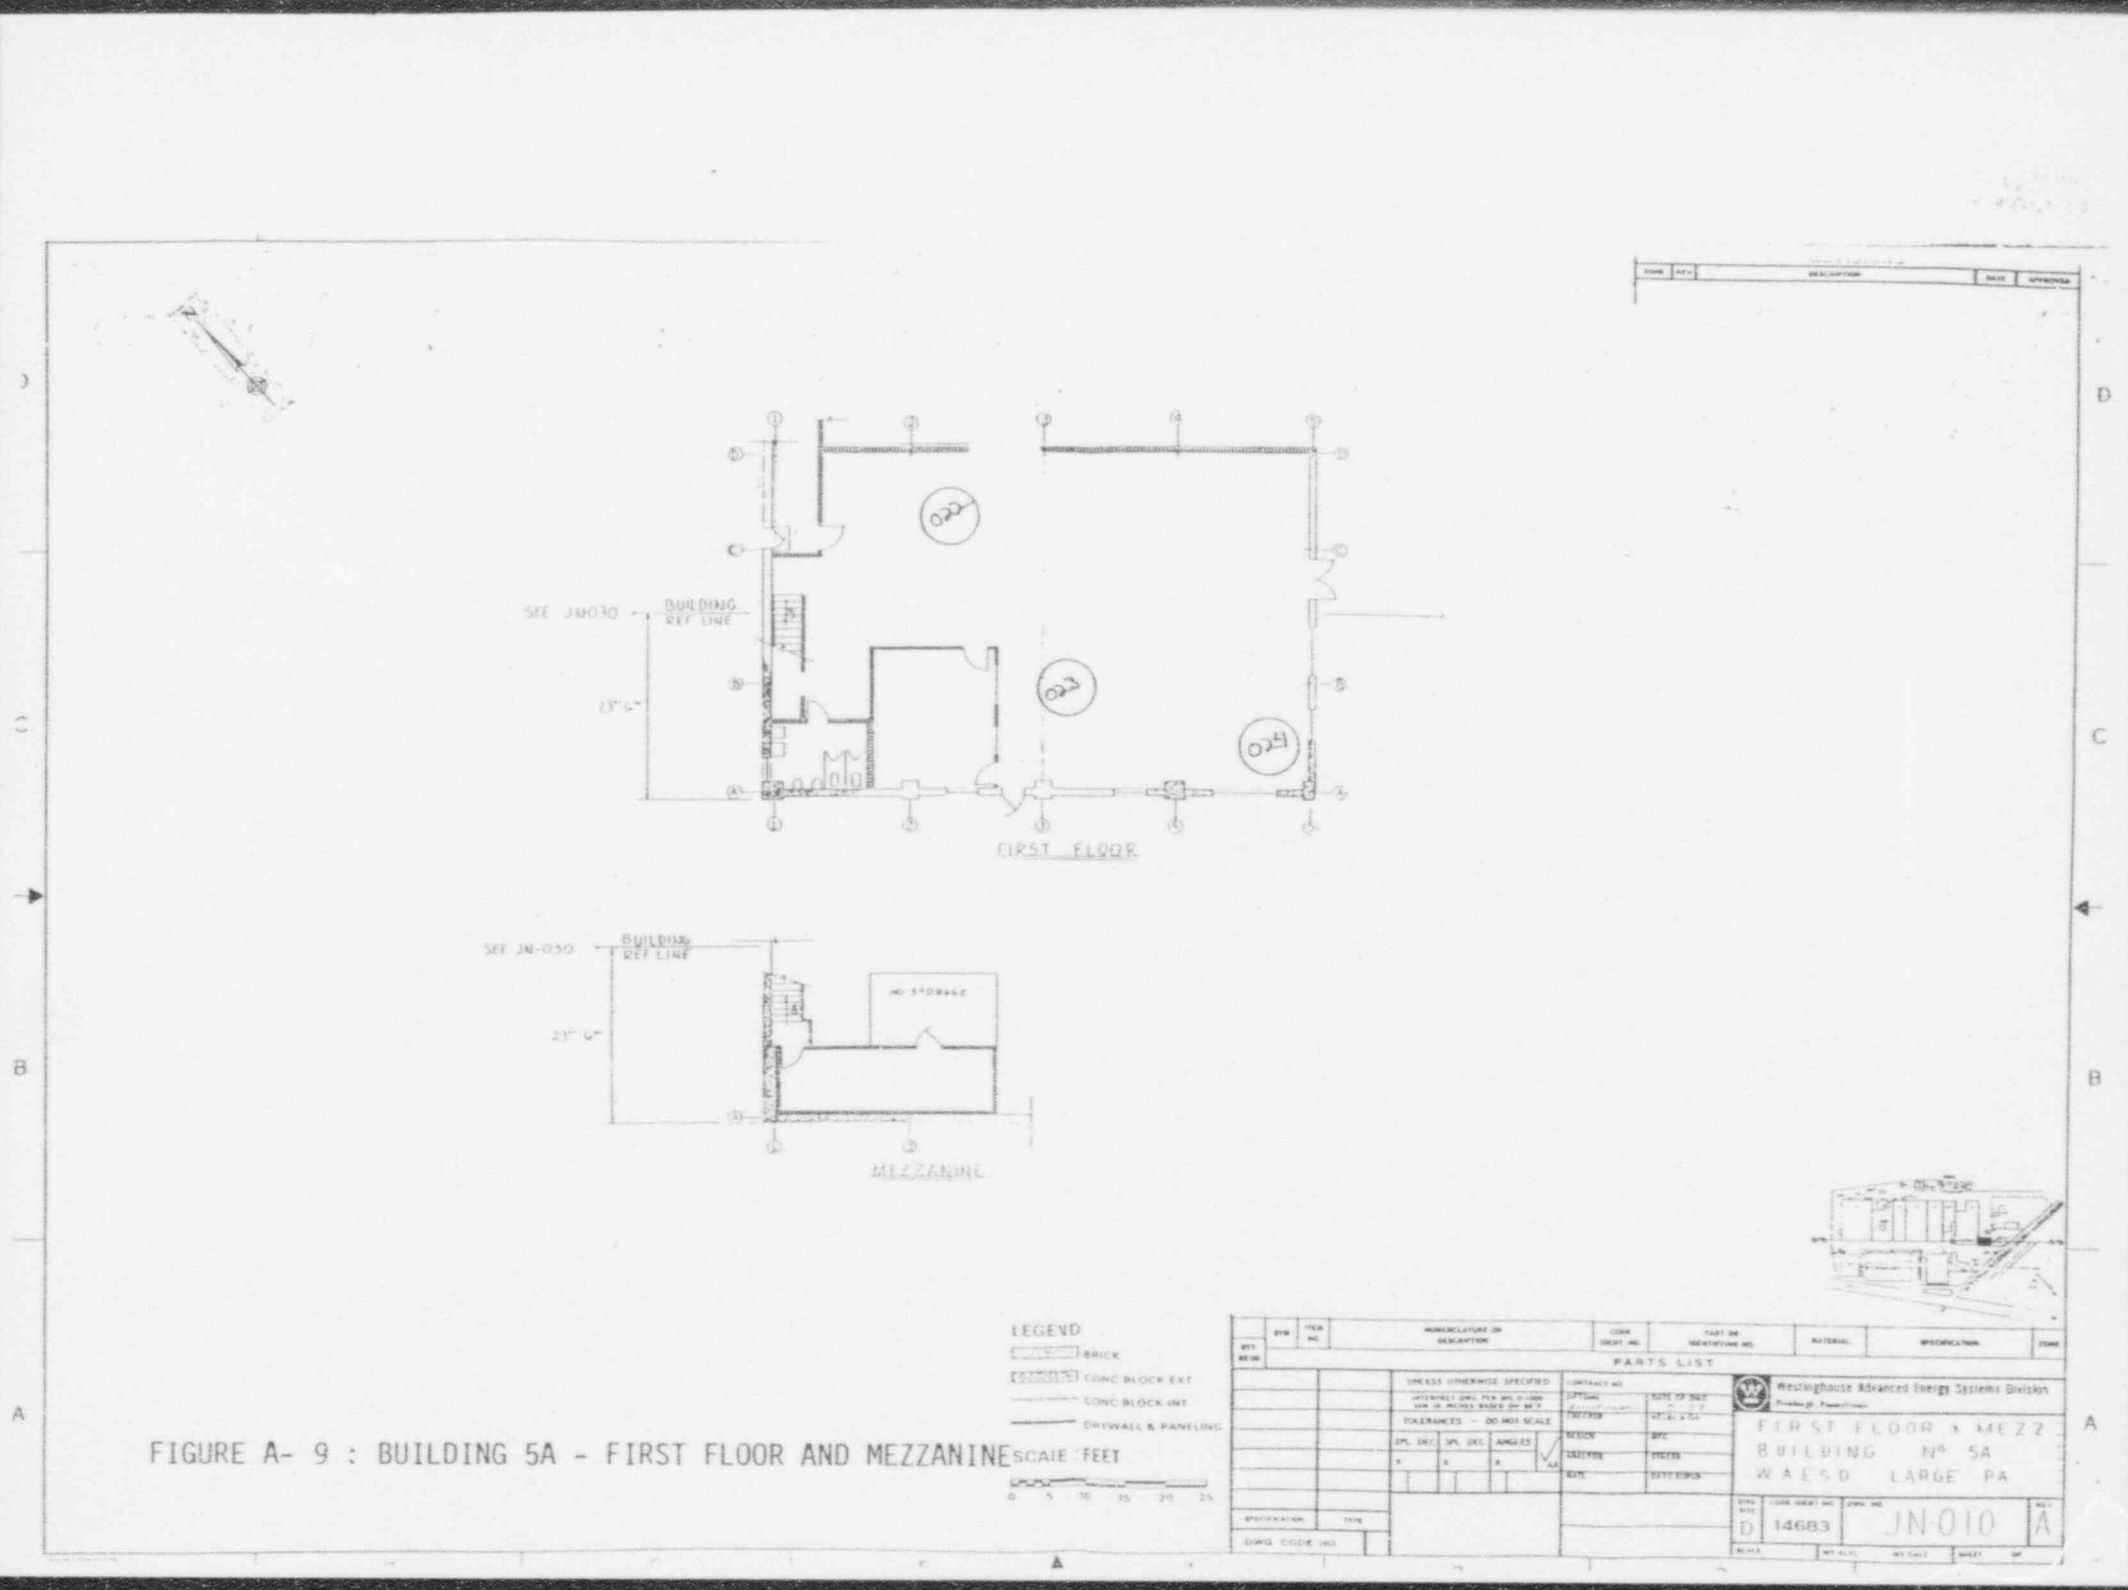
BUILDING 5A - FIRST FLOOR AND MEZZANINE
